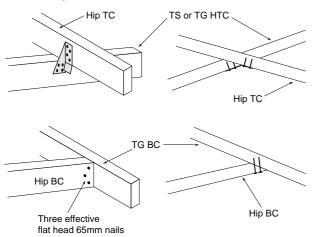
Typical trussed hip end connection for Wind Classification N1, N2, N3 or C1
